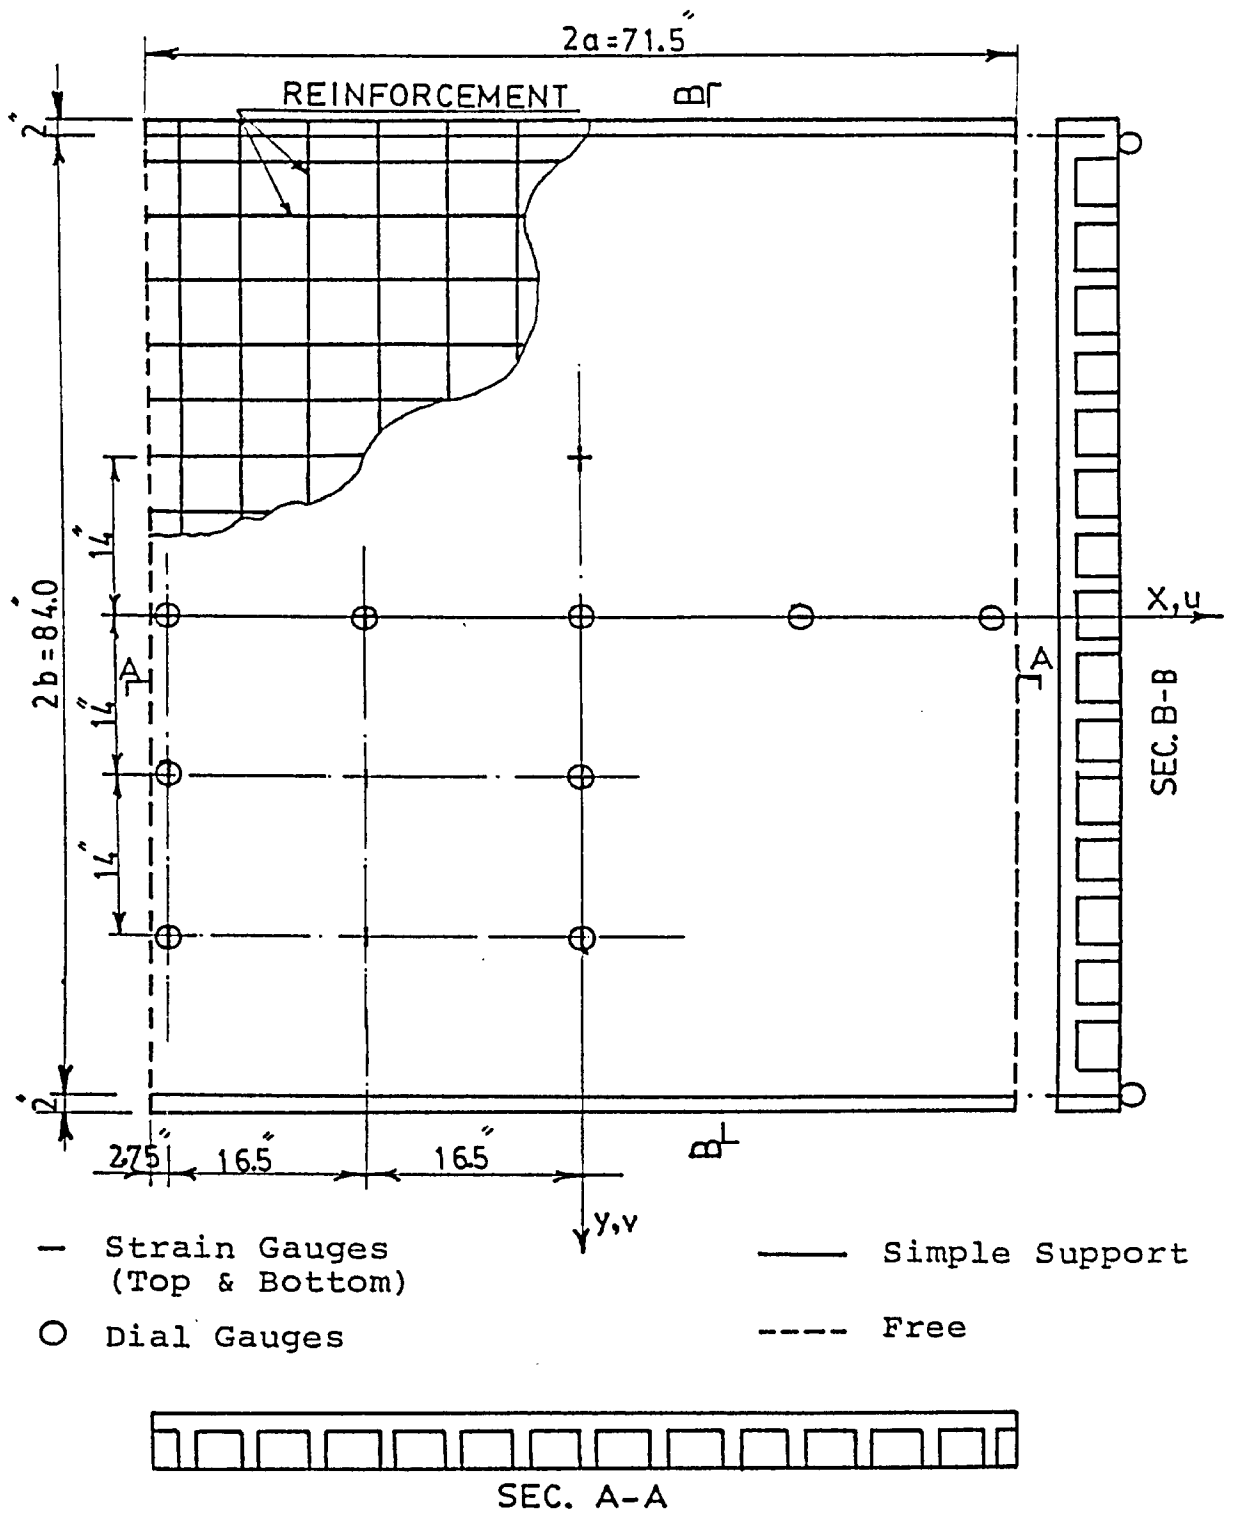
REINFORCED CONCRETE WAFFLE SLAB A.1
